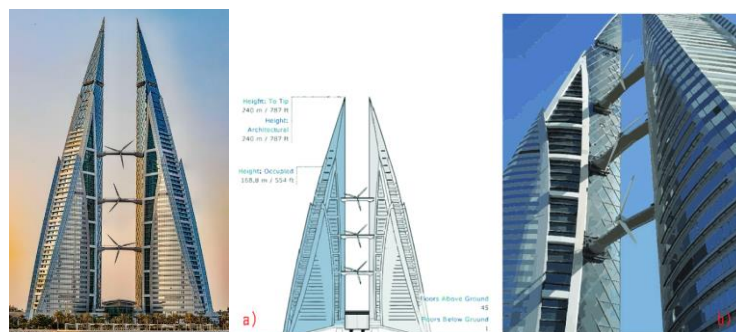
The Wind turbines joined in between two towers of Bahrain World Trade Center: elevation view (a) general view (b) URL-9 and (Stathopoulos et al., 2018).
